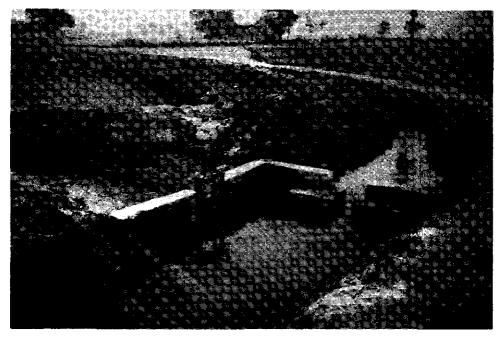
Concrete water division structure within a tertiary unit in Blocks 1 and 2 of MIP-I (1993)
